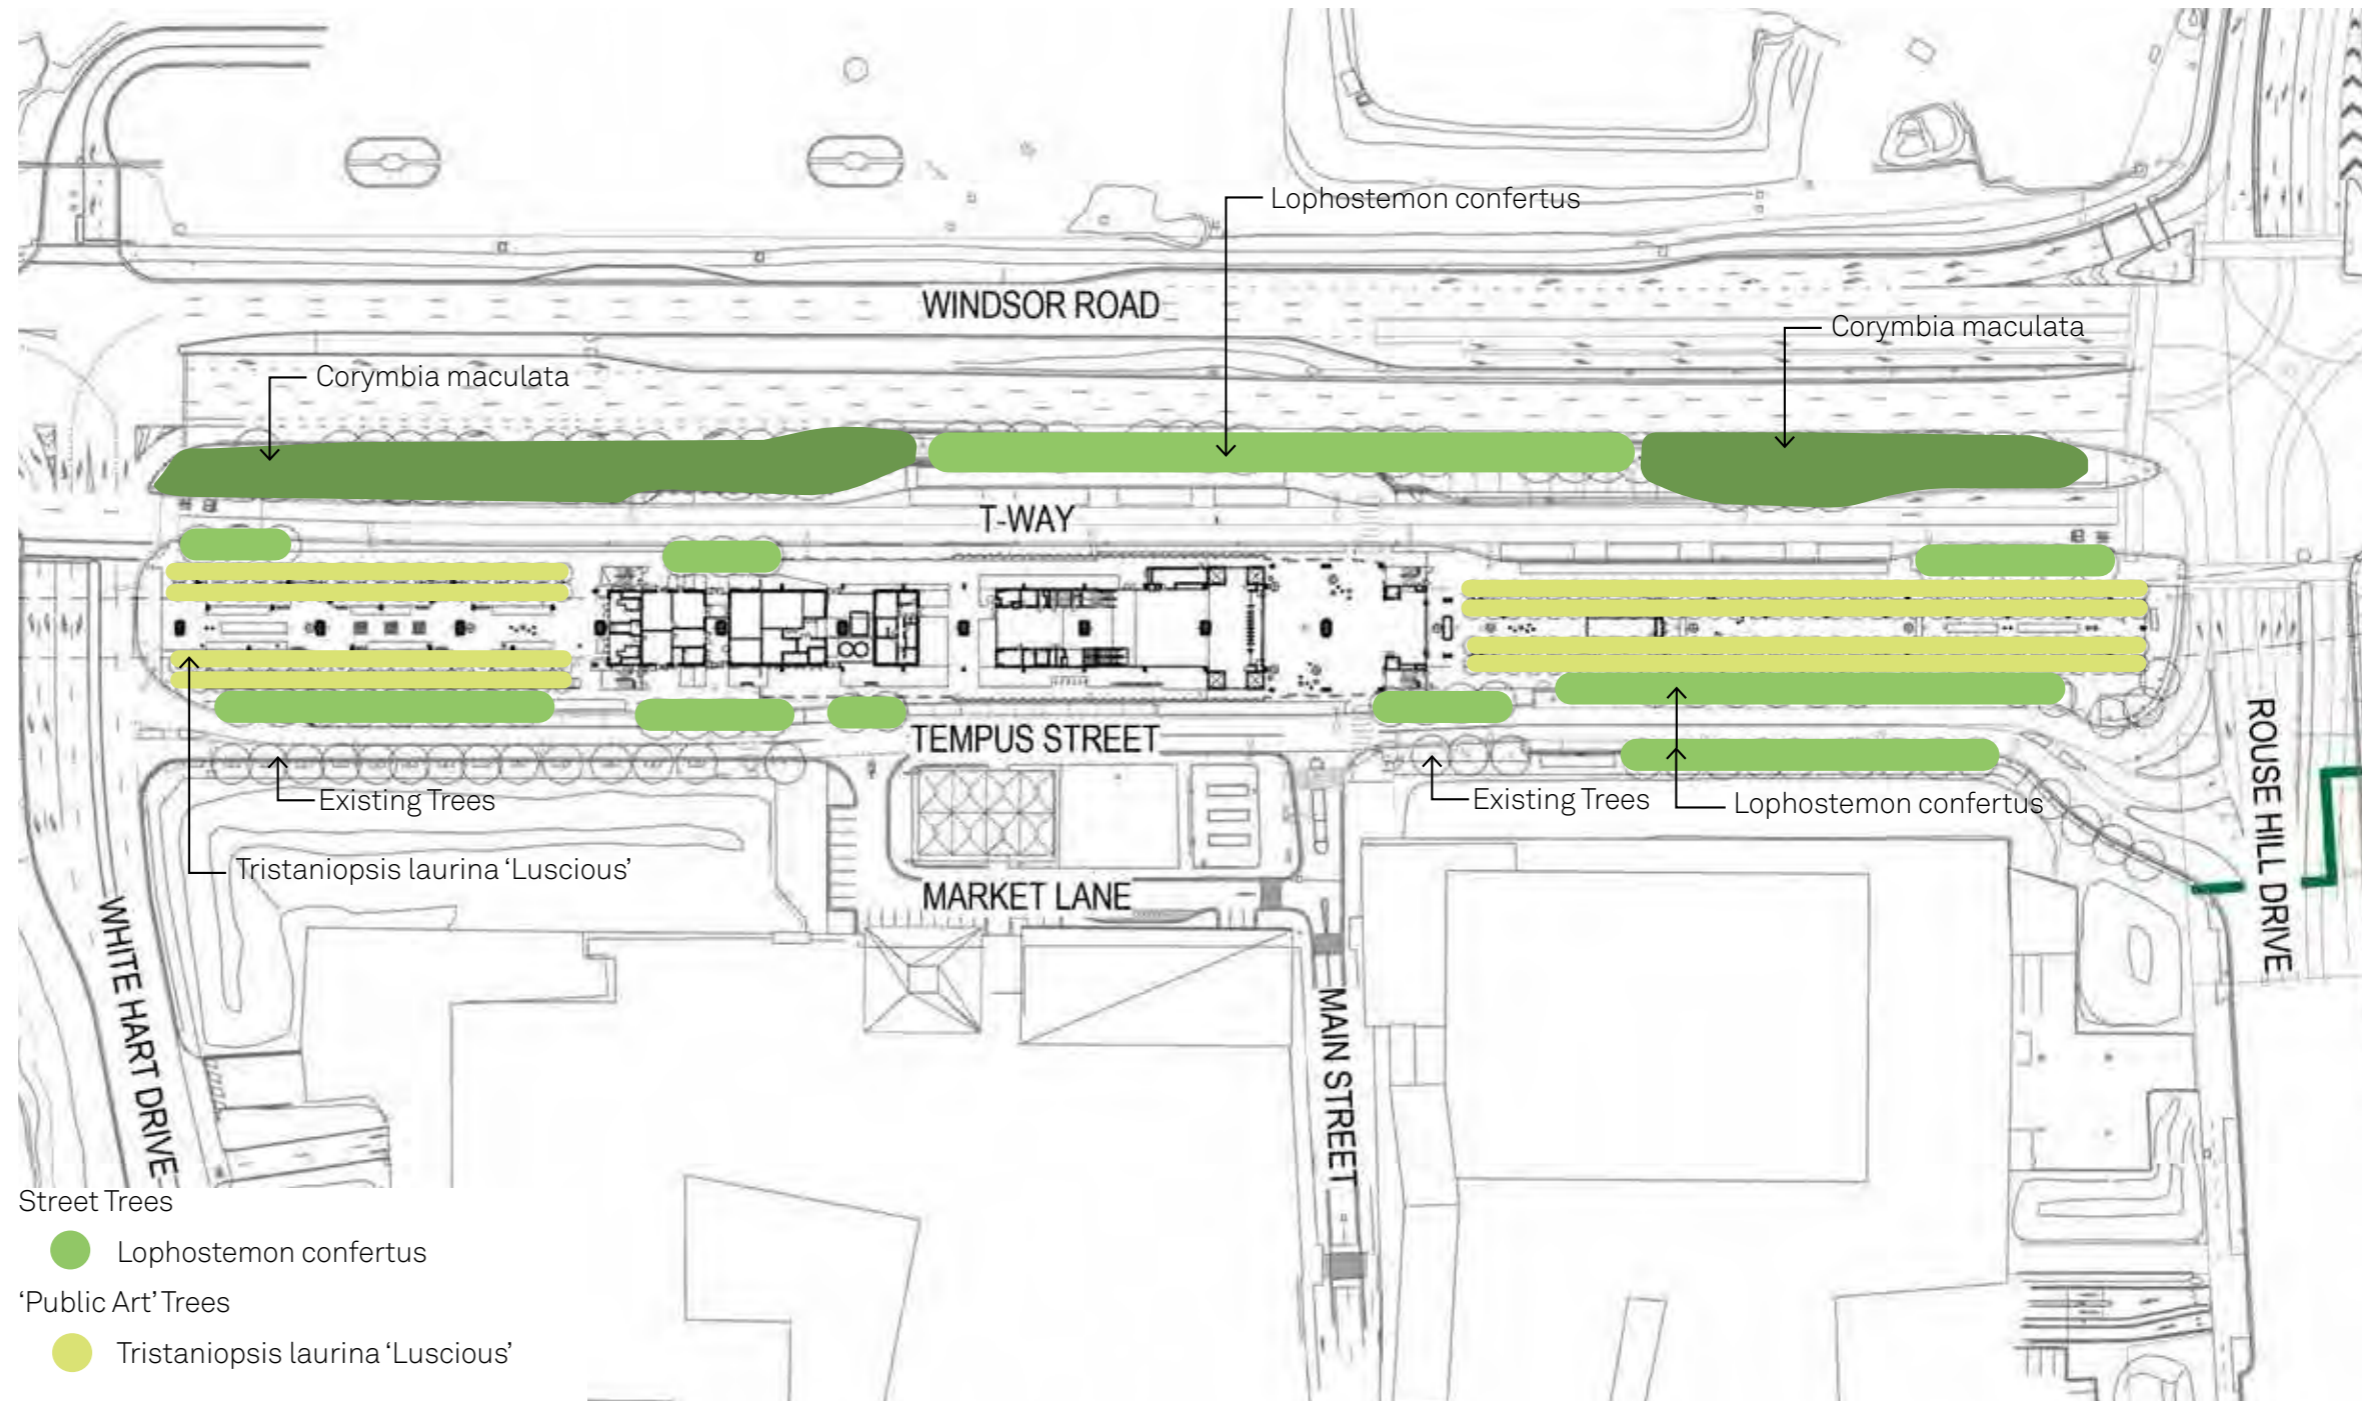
RSH\_Rouse Hill Station Precinct Planting Plan. Source: HASSELL.
